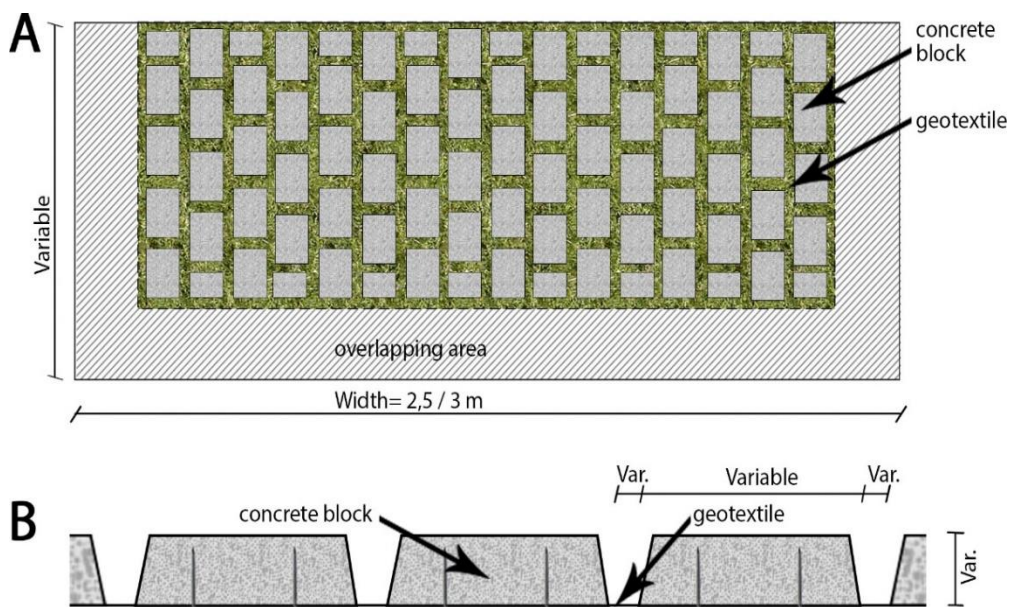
A) Trevimat plant; B) Trevimat Cross Section.
